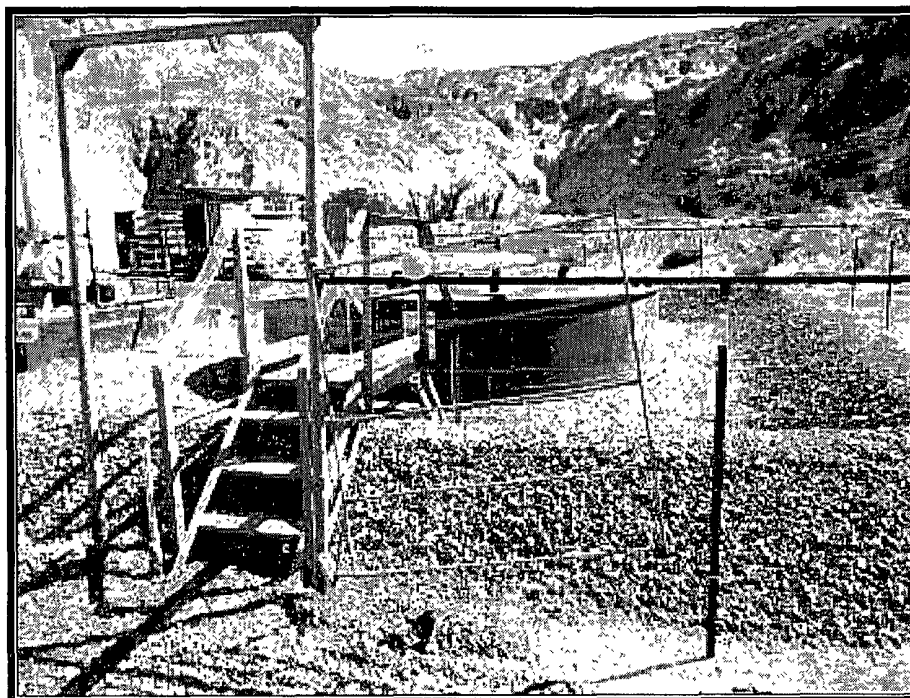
Jack Frost B #1E after Backfill and Tank Re-Set (view 2)
